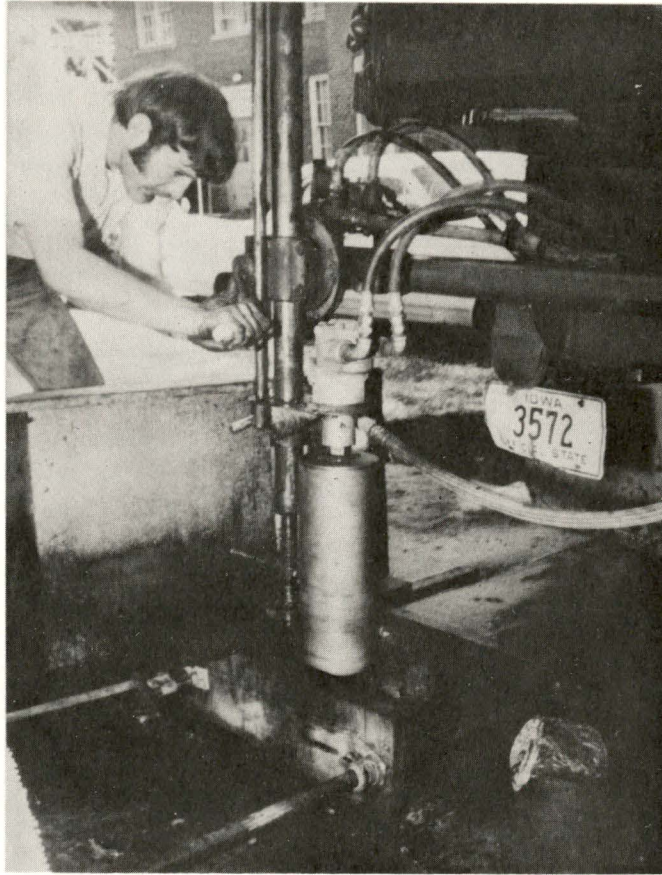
First stage in sample preparation for bore-hole shear tests on coal.
